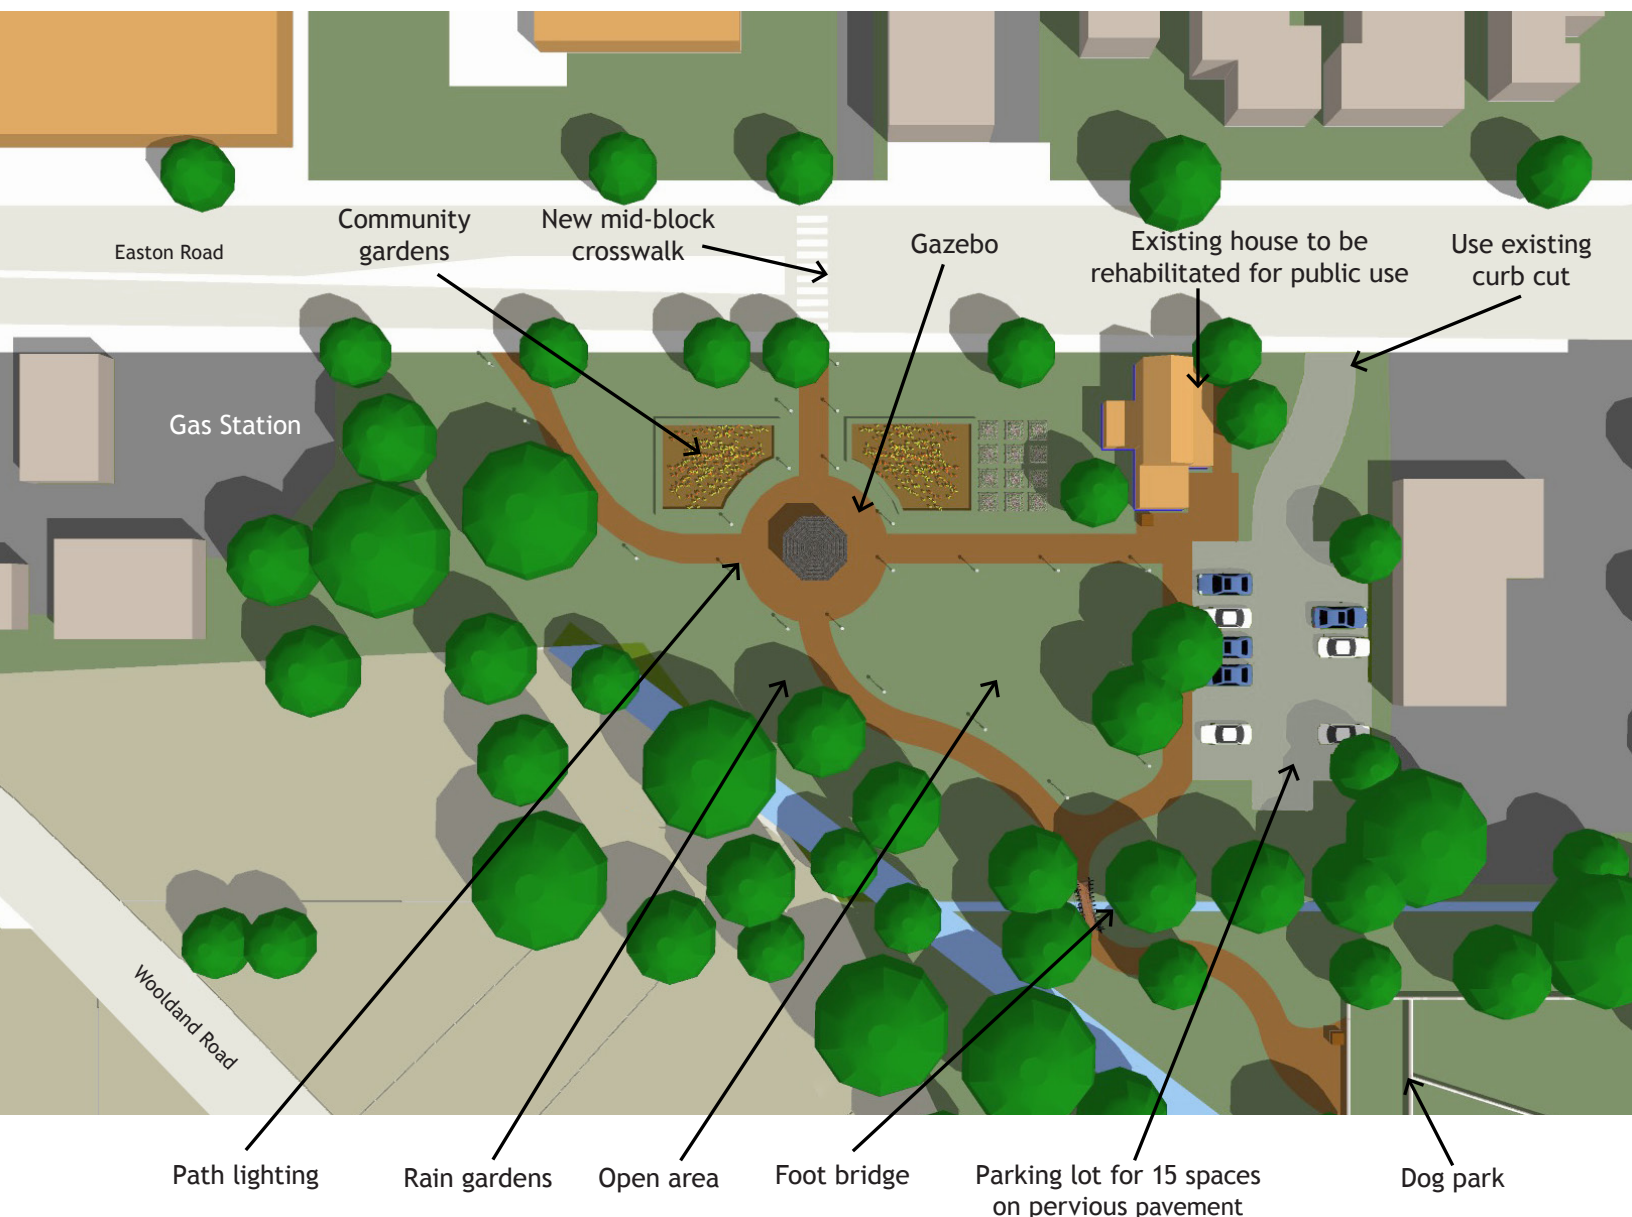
Conceptual site plan of new entrance to Grove Park along Easton Road
